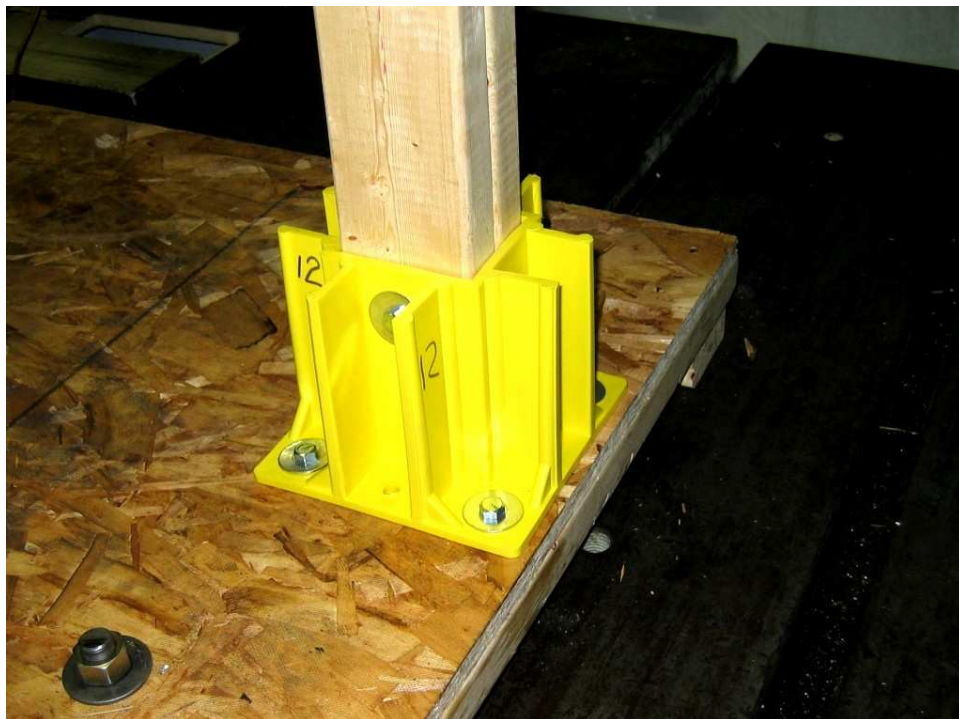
23/32 plywood sub-floor installation for cold temperature test
